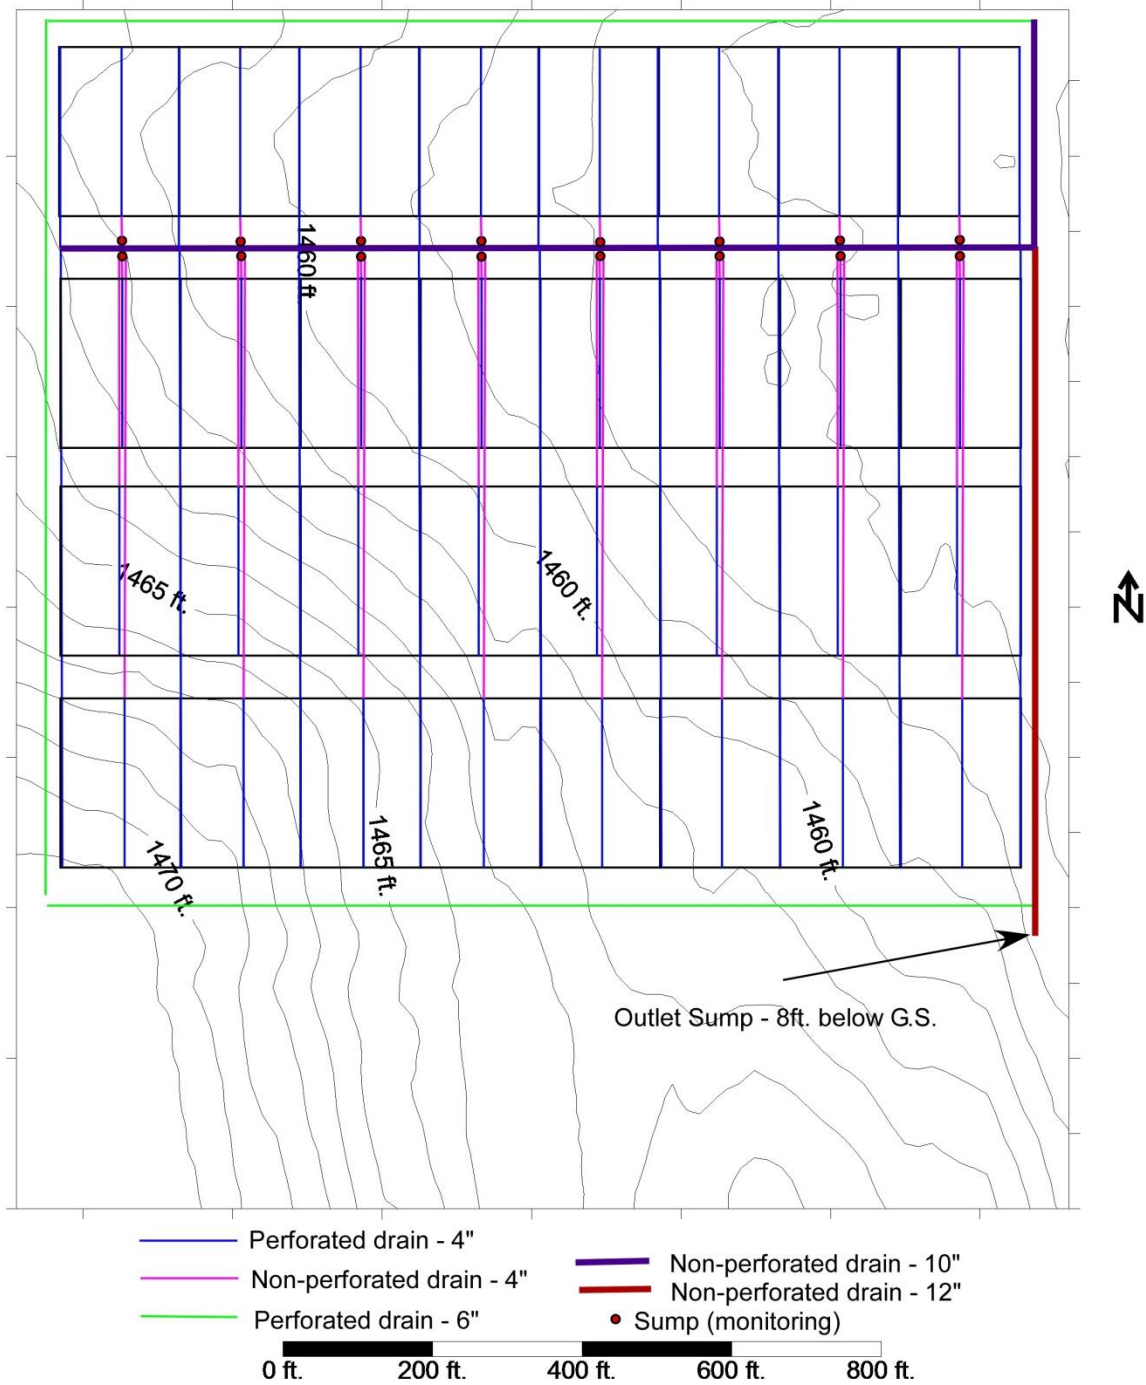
Subsurface overall site drainage layout, with elevation contour lines.
